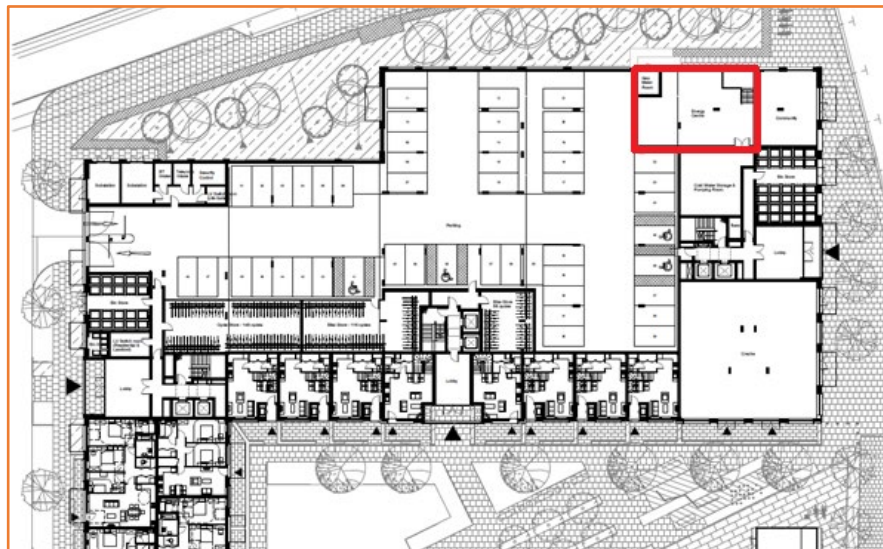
Extract of Hybrid Permission (Ref.16/10482/FUL) approved plan Ground Floor Plan rev E 01195\_JTP\_BD\_100 (JTP Architects, 2017).
